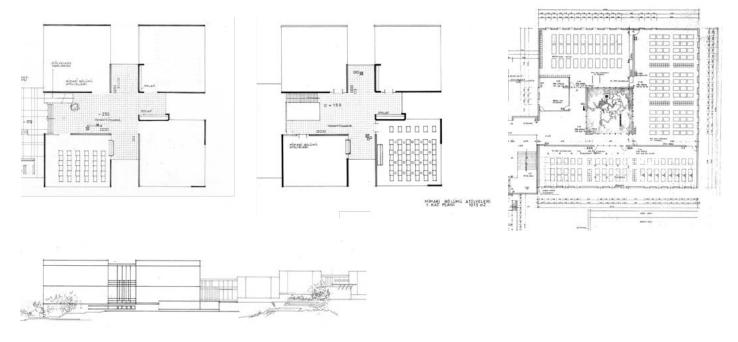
The D block plan drawings and west façade in the competition project, the first floor plan drawing of the D block in the conceptual project (repeating on the ground floor).
